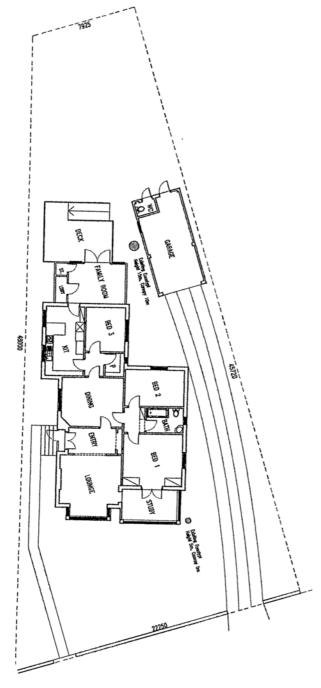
Extract from 1995 DA plans showing the configuration of the house as it was at that time. The family room and deck at the rear are later additions to the original form of the house. Source: North Sydney Council, DA1181/95.
